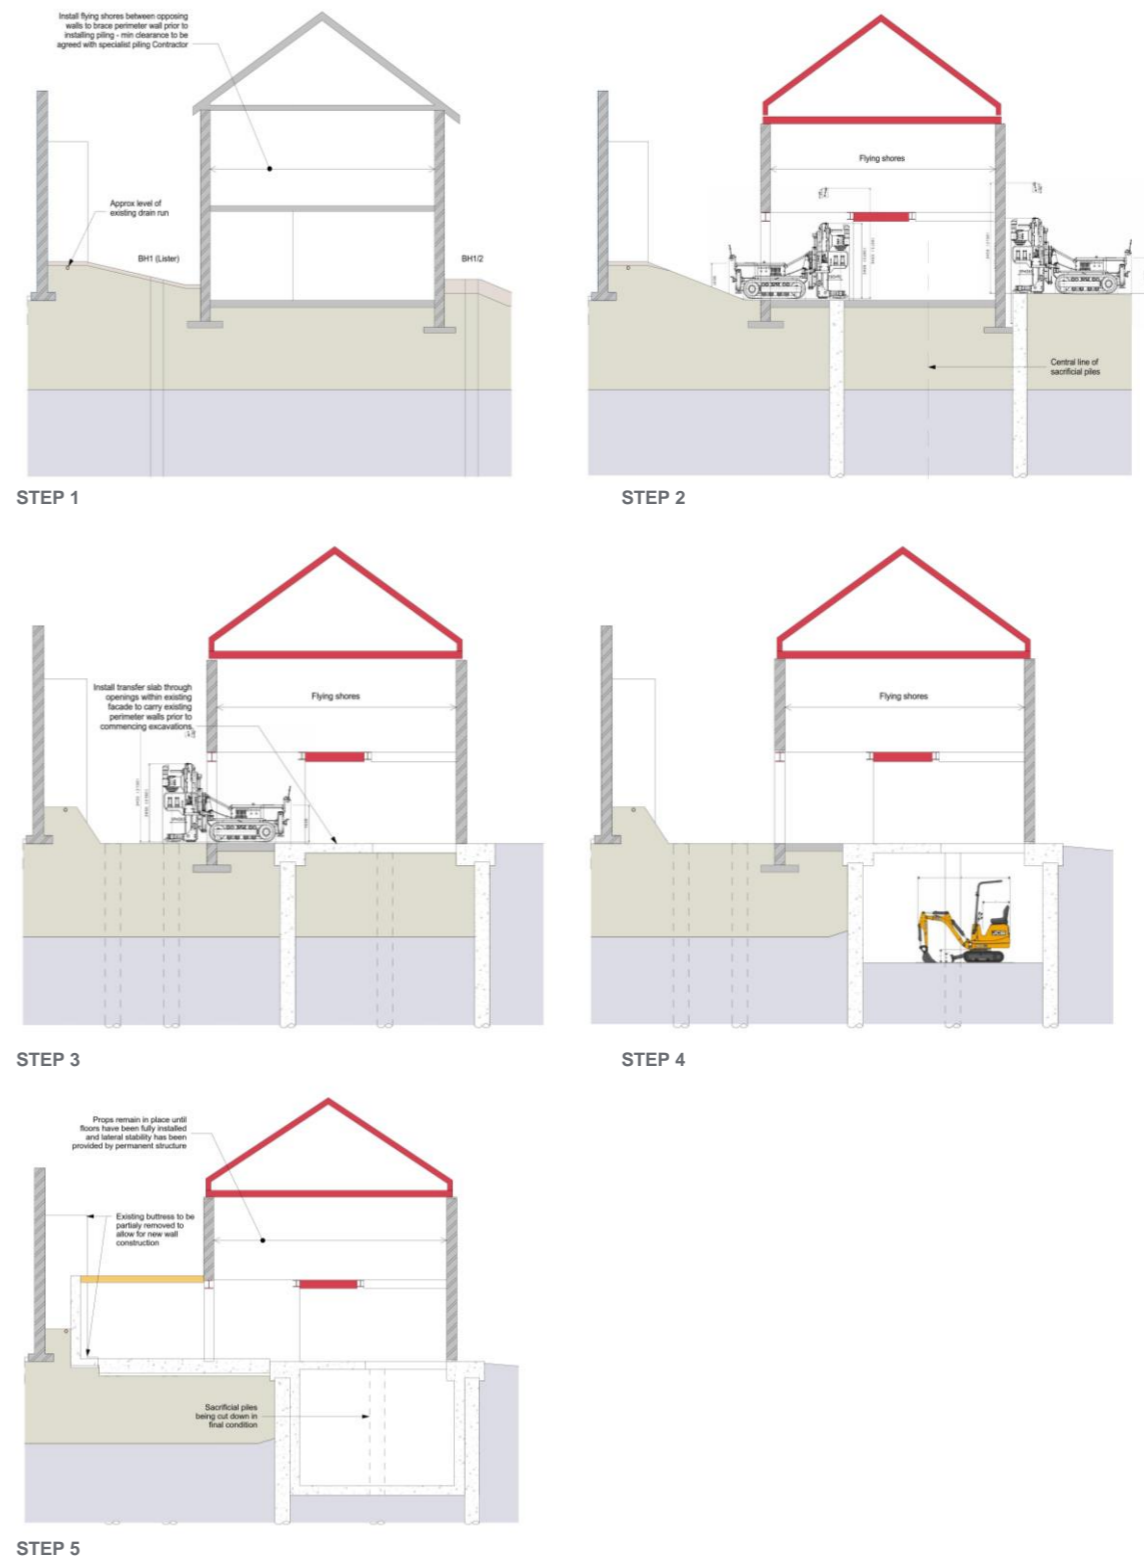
Suggested Construction Sequence – Sectional View – The 5 Stages Of Excavation; 1) Existing Condition, 2) Install Temporary works and Commence Piling, 3) Cast Ground floor Slab for Top-down Construction, 4) Commence Excavation to Formation level, 5) Install Basement Heave matt and ground slab prior to tanking internally
